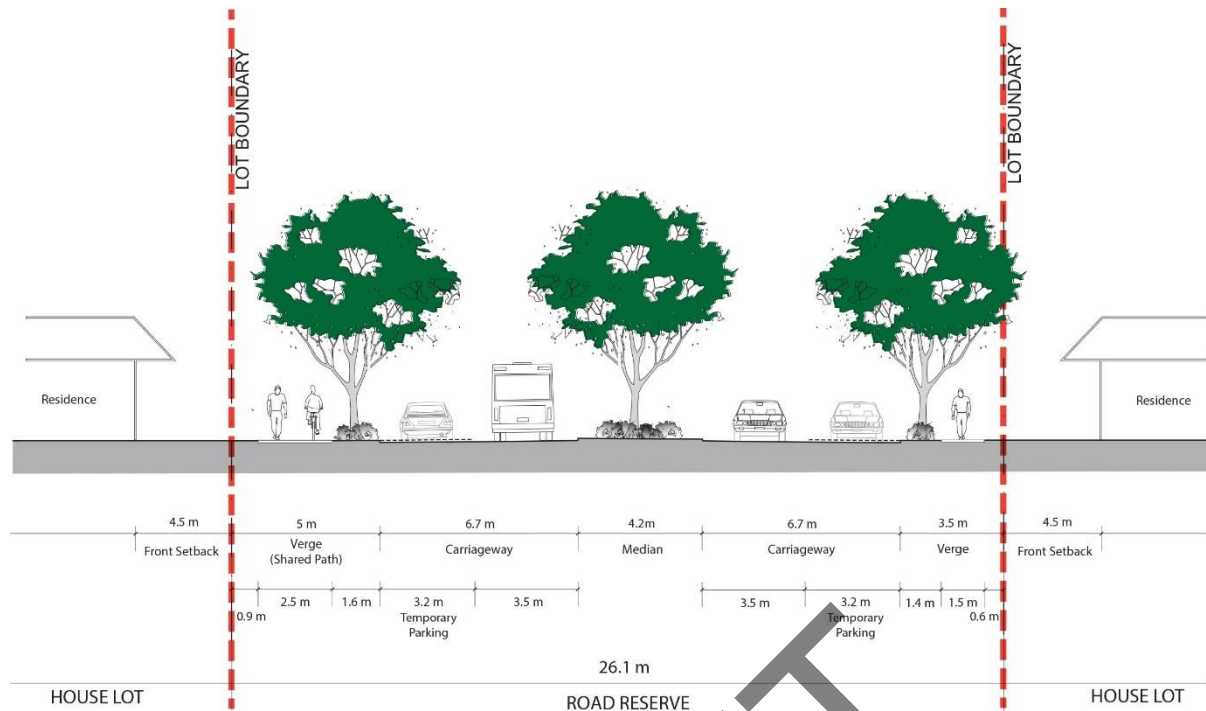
Dransfield Drive Extension Collector Road (Short Term)
